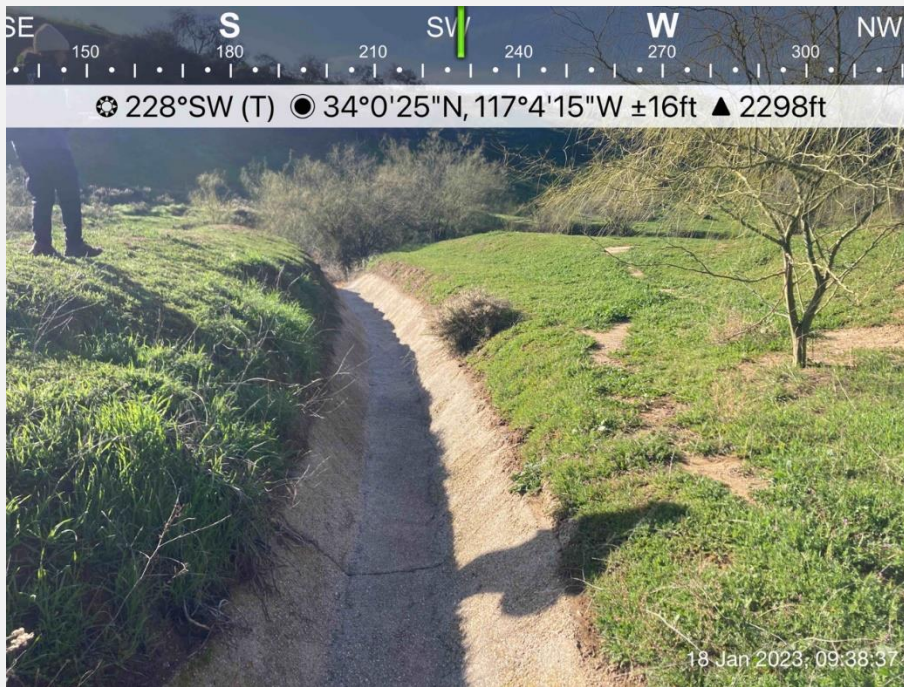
View of T-04 collected at engineered trapezoidal portion of NWW-5, facing southwest.
